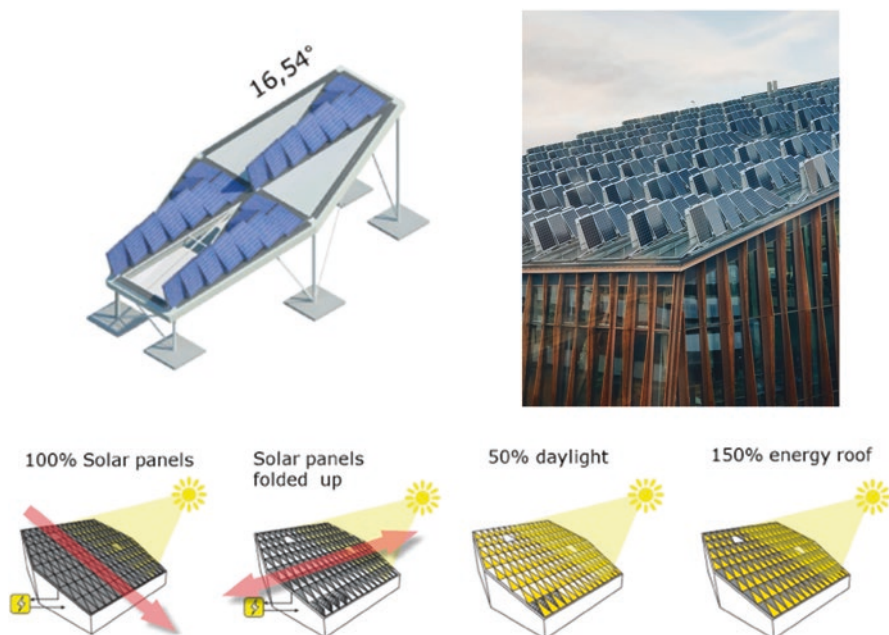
Solar panel roof with windows for daylight. [Source: Arch20]
